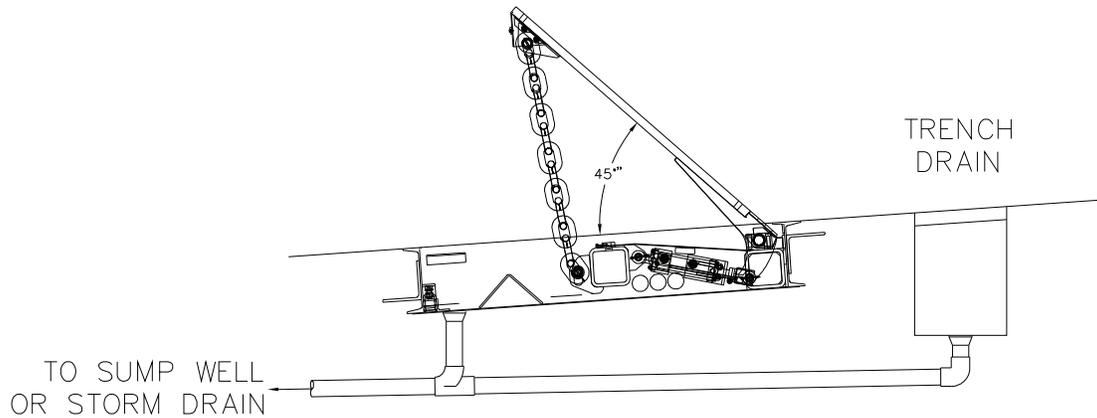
DSC2000 Barrier installed in roadway ramp. Note the trench drain in the rear to minimize the amount of water that the Barrier drainage must handle.
